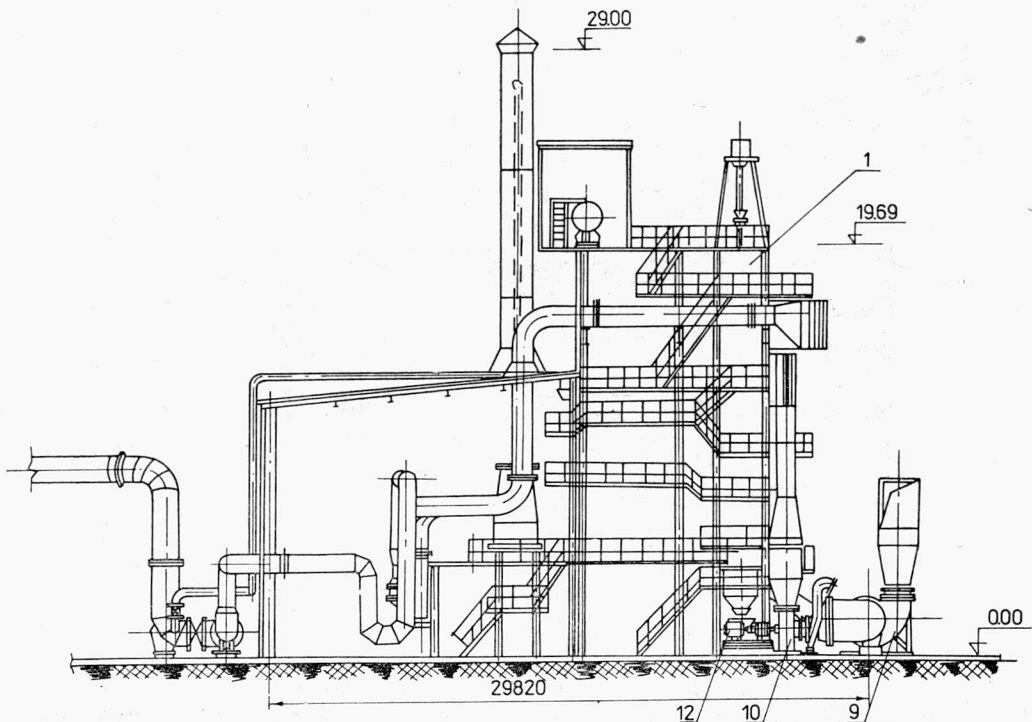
Partially-enclosed boiler plant with PKK-30 /45-70 steam generators, side view
